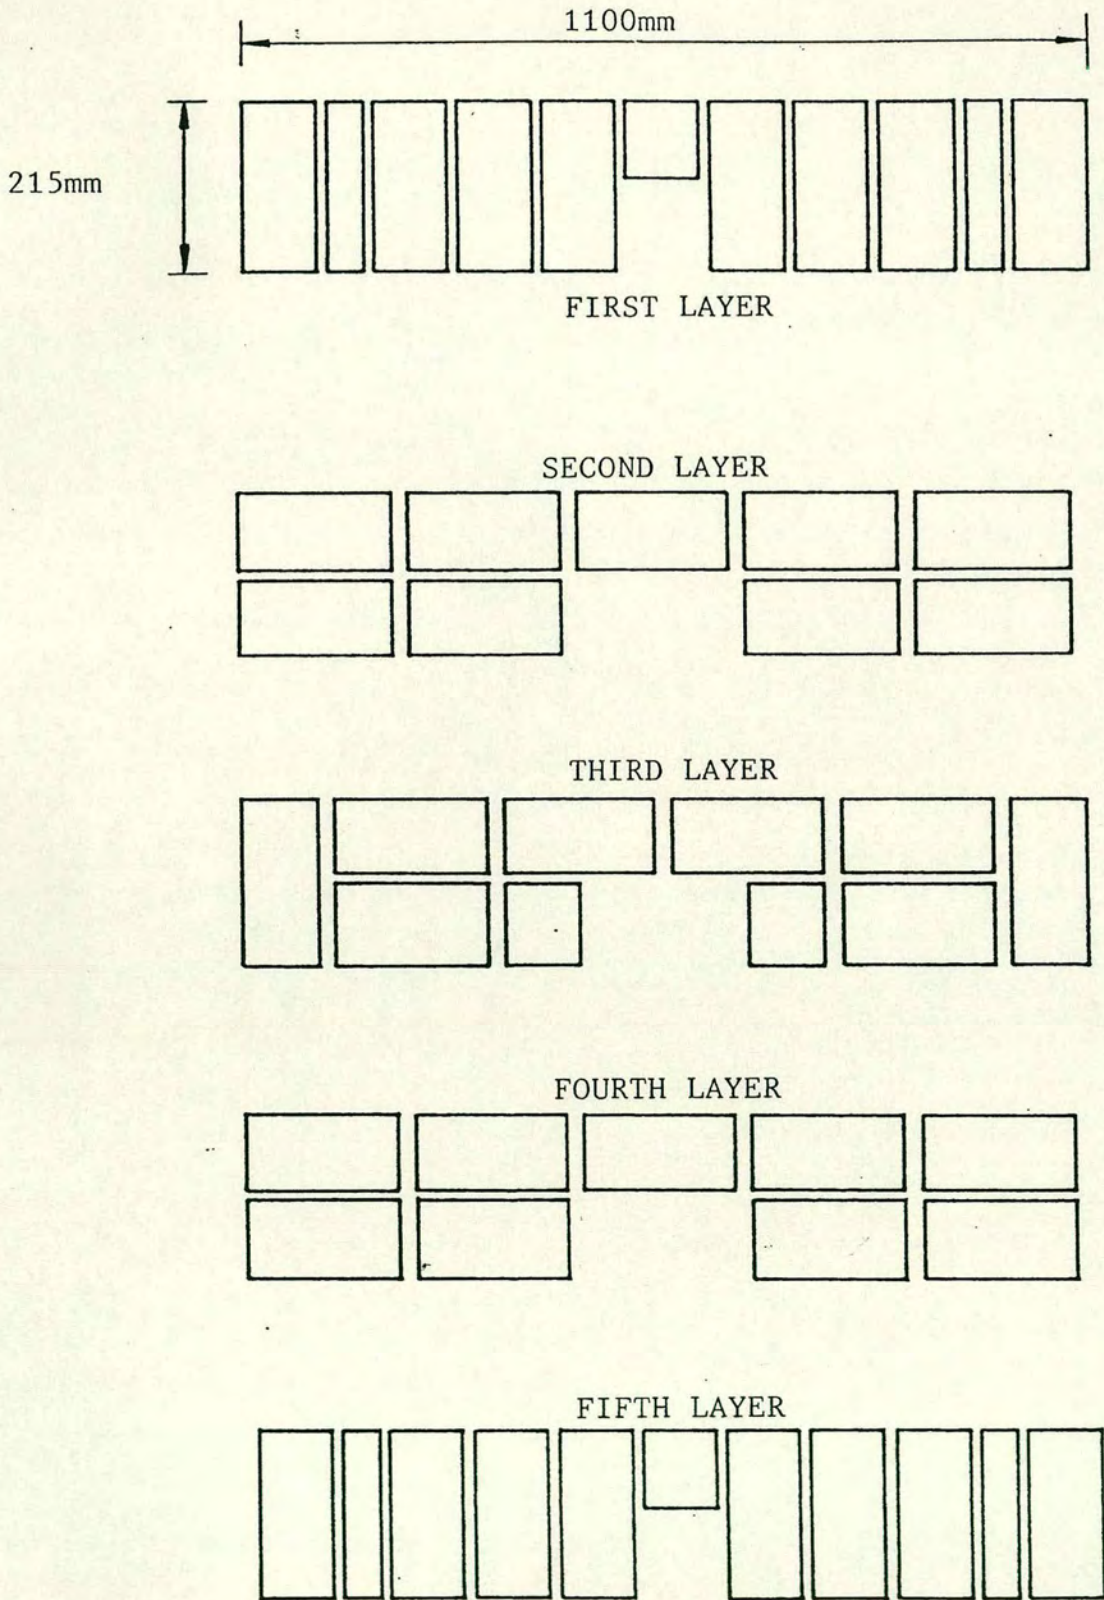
English Garden bond beams cross-sections (B7-B8)
